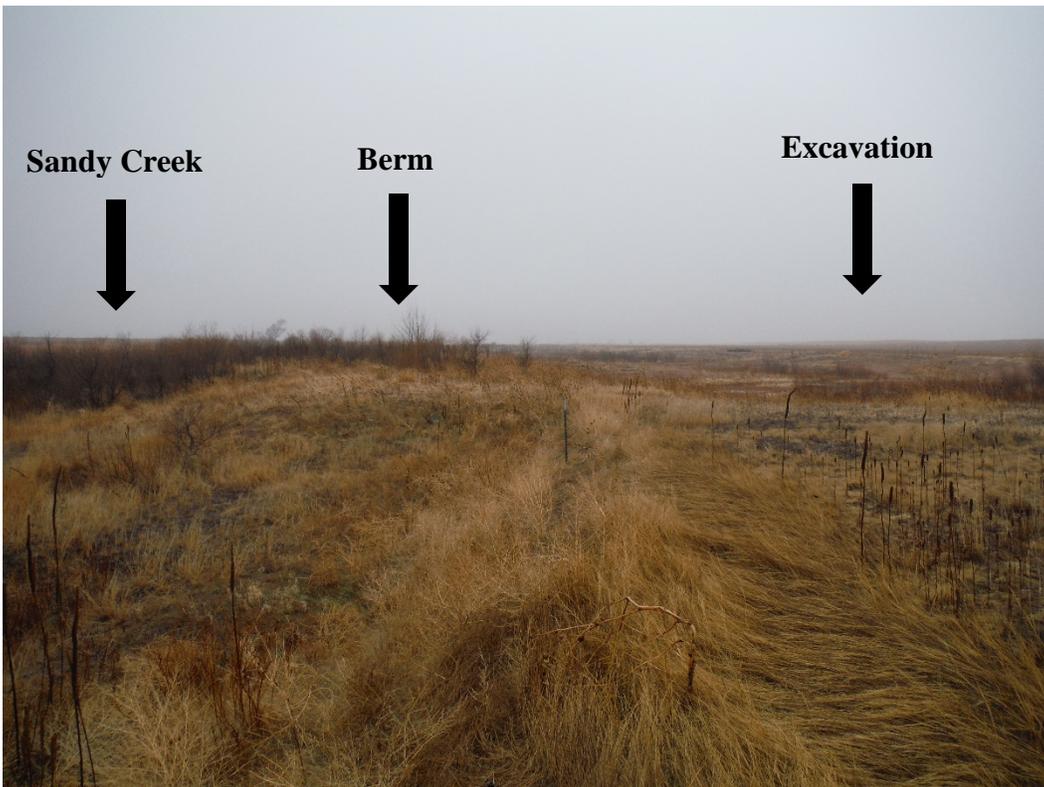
Berm located between creek channel (left) and excavation (right); looking southwest.
